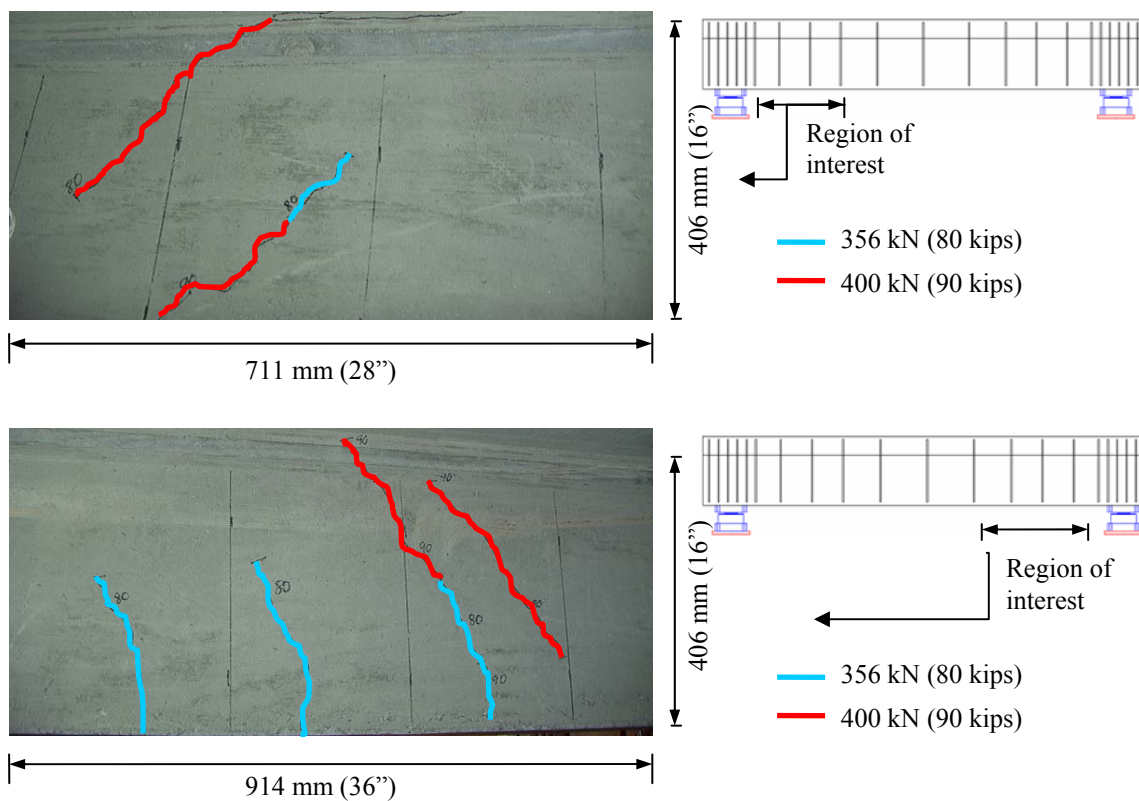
Shear cracks in the center girder at the end of Phase 1 of test
